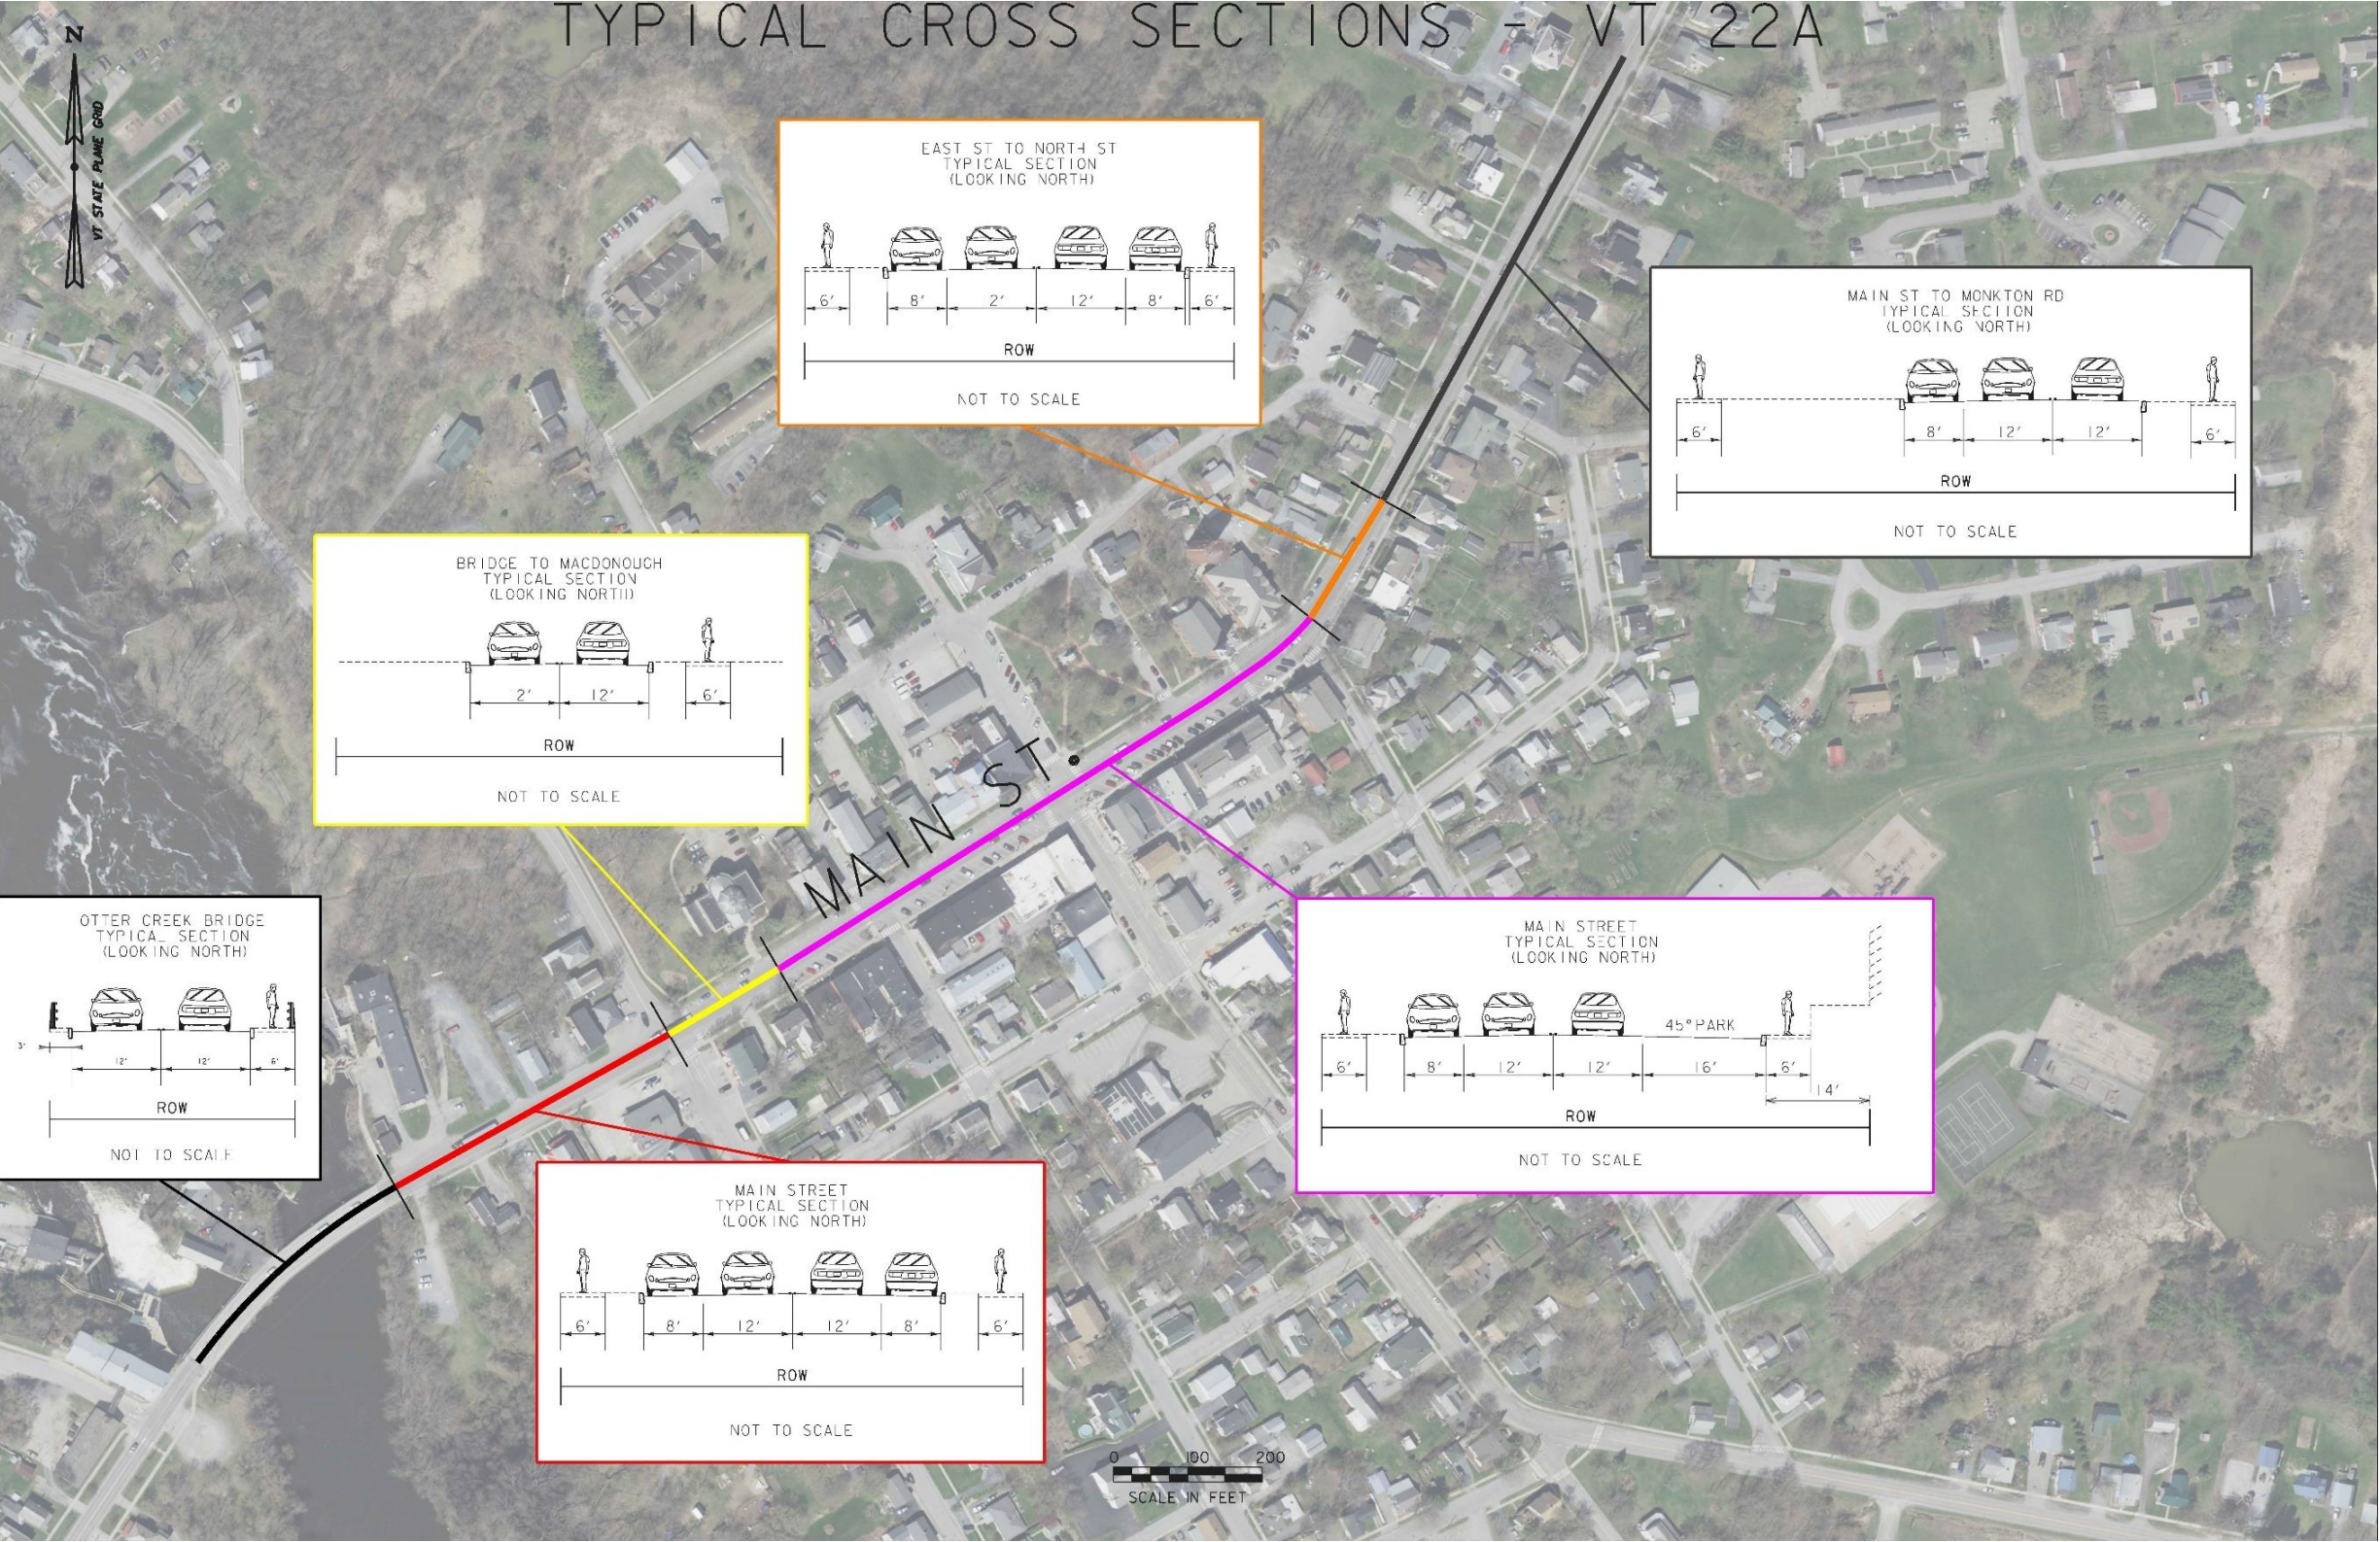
Downtown Vergennes Subarea and Roadway Cross Sections
